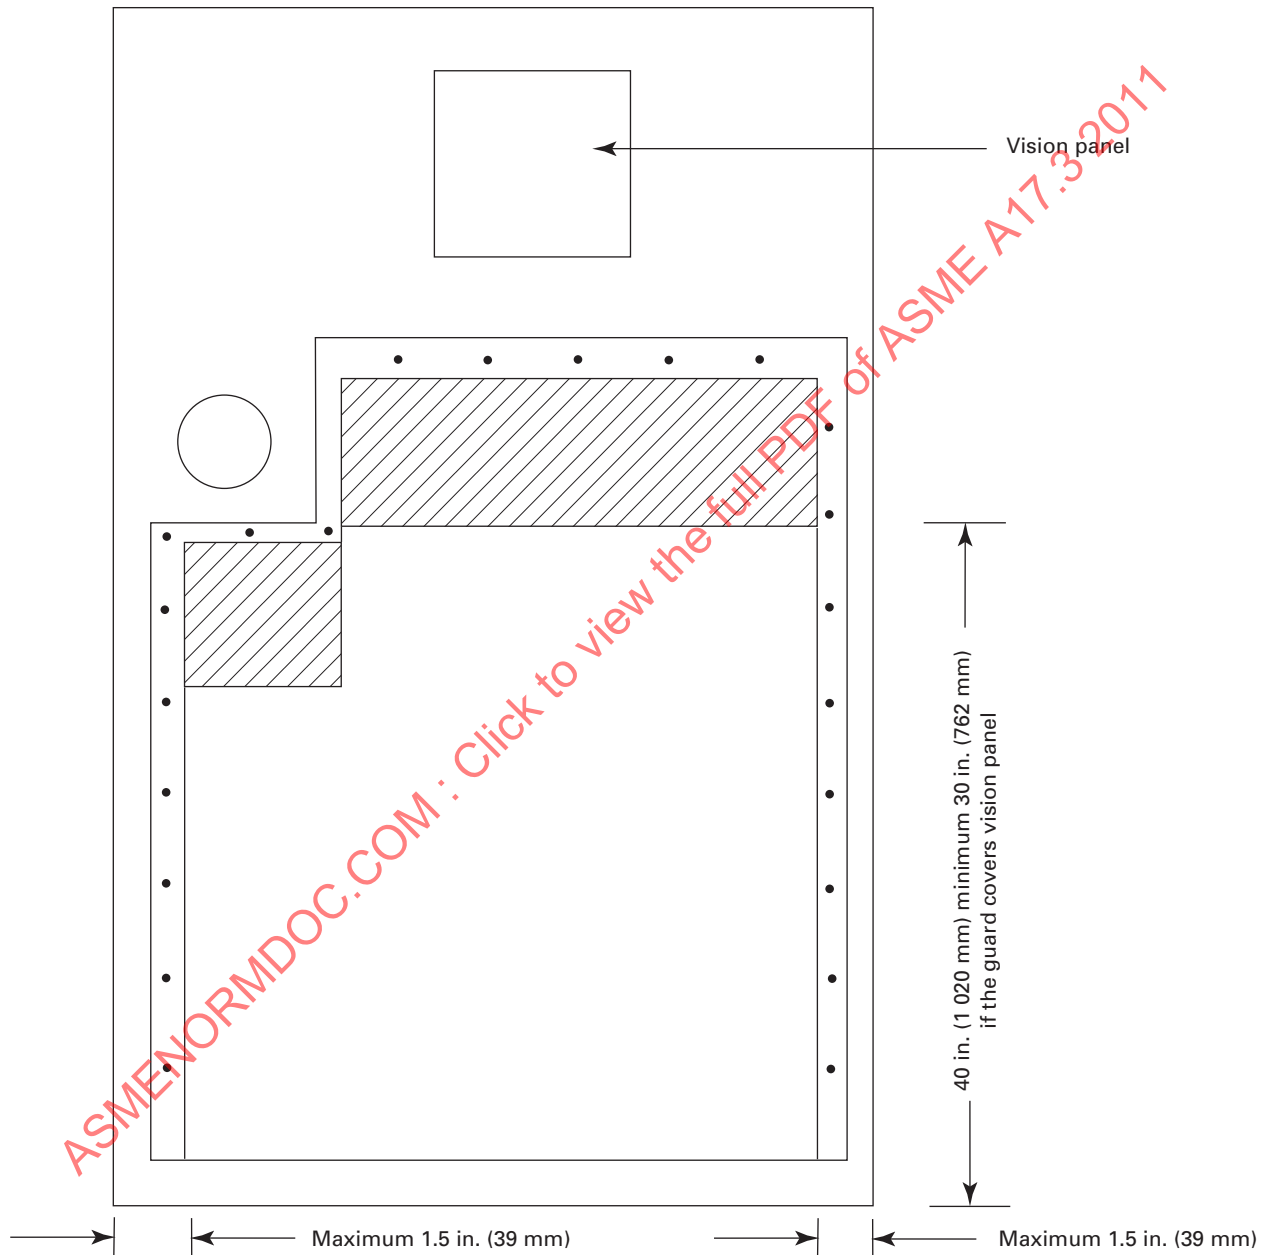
Typical Swinging Hoistway Door Space Guards
